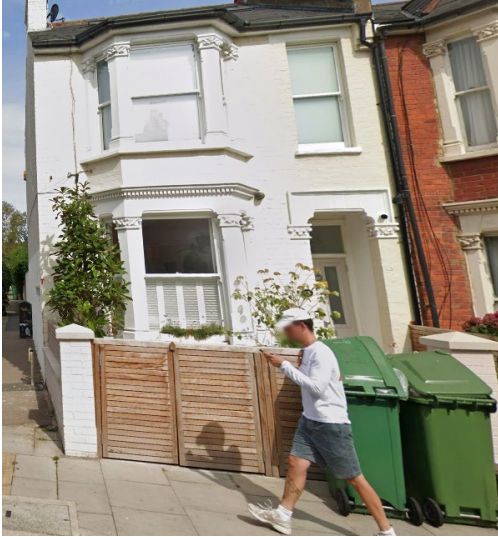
38 Sumatra Road, NW6,, storage unit visible behind the front boundary. Same Size and Scale as proposed application (Photo)
